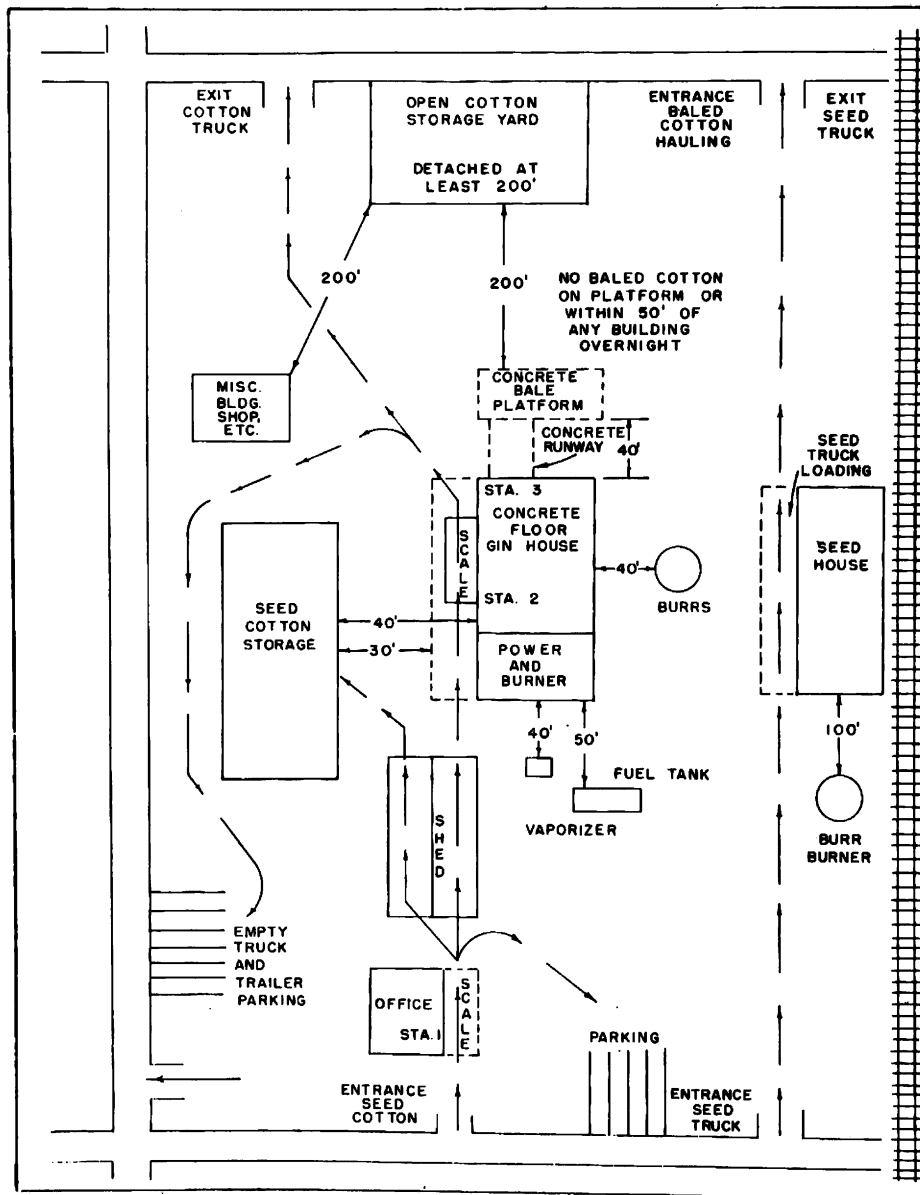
Gin yard design showing separate office and minimum safe distances between buildings for protection from fire.
